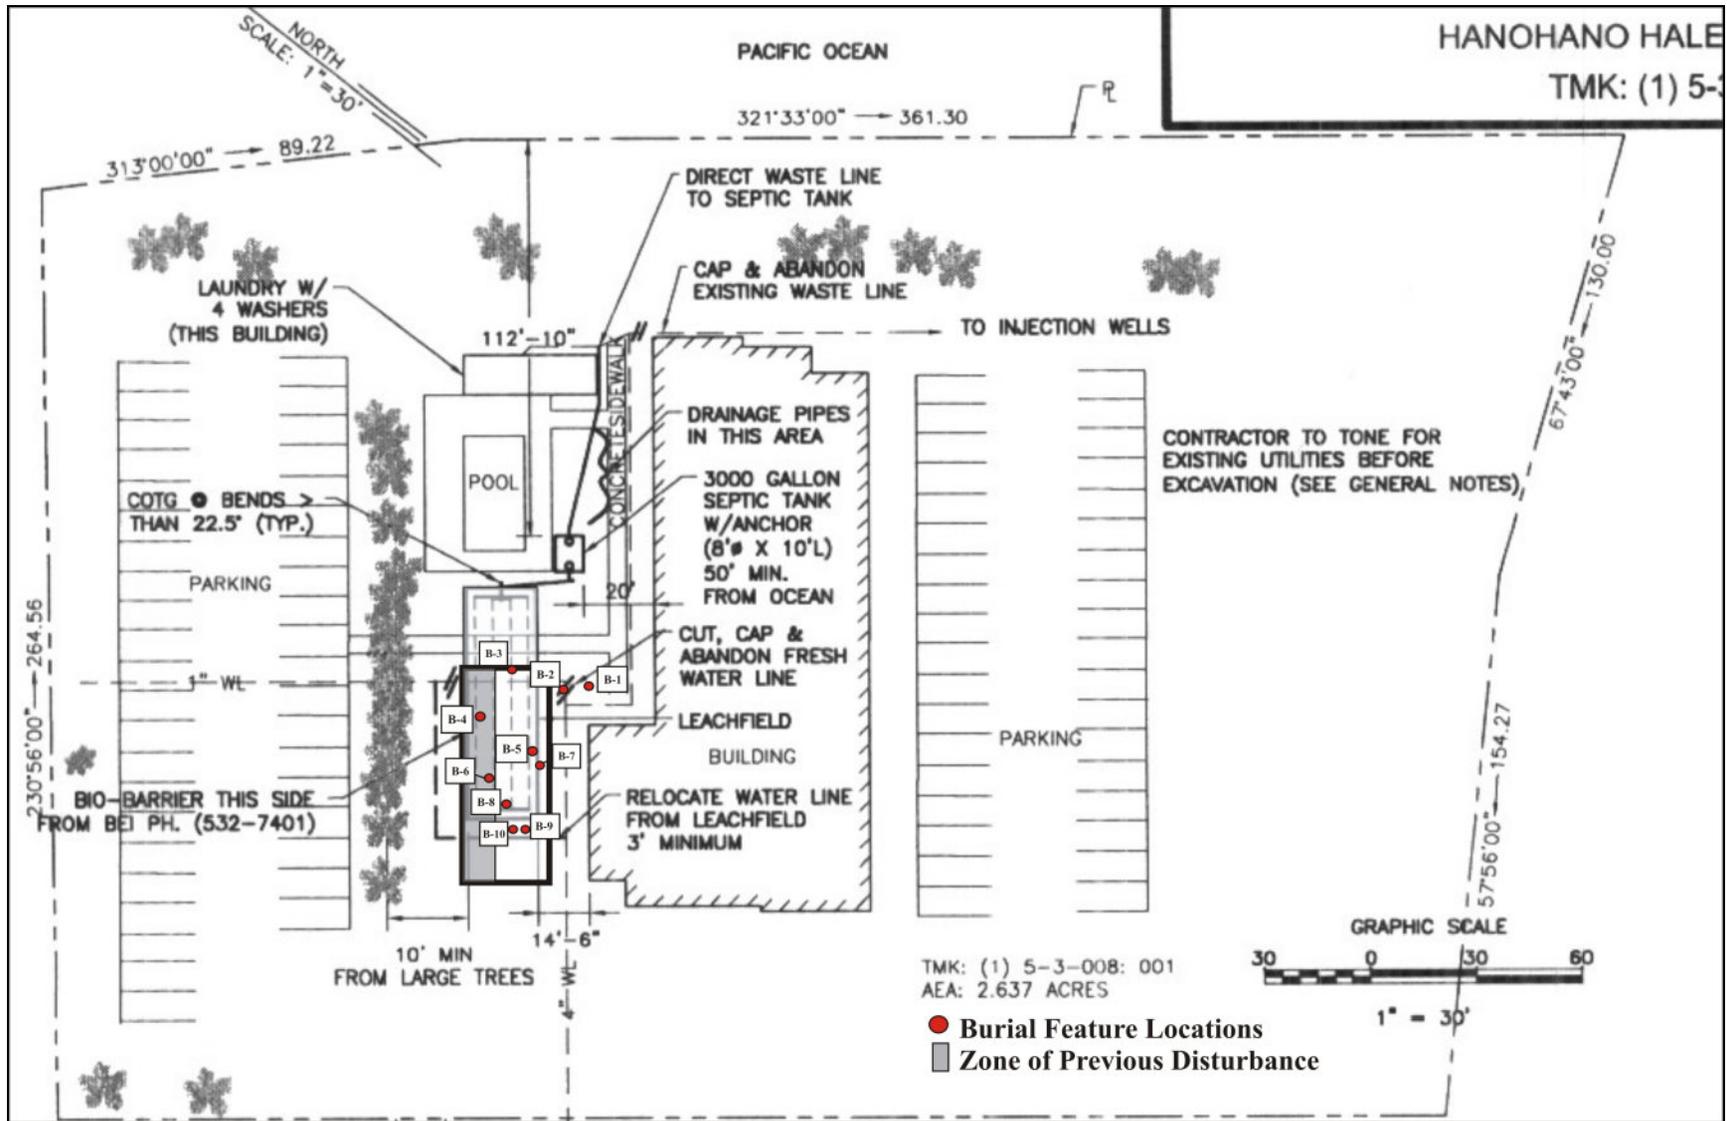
Revised GWS Excavation Plan Depicting Site 50-80-06-7120 Burial Feature Locations and Zone of Previous Disturbance (Note: Revised Excavation Plan Overlays Original Plan.)
